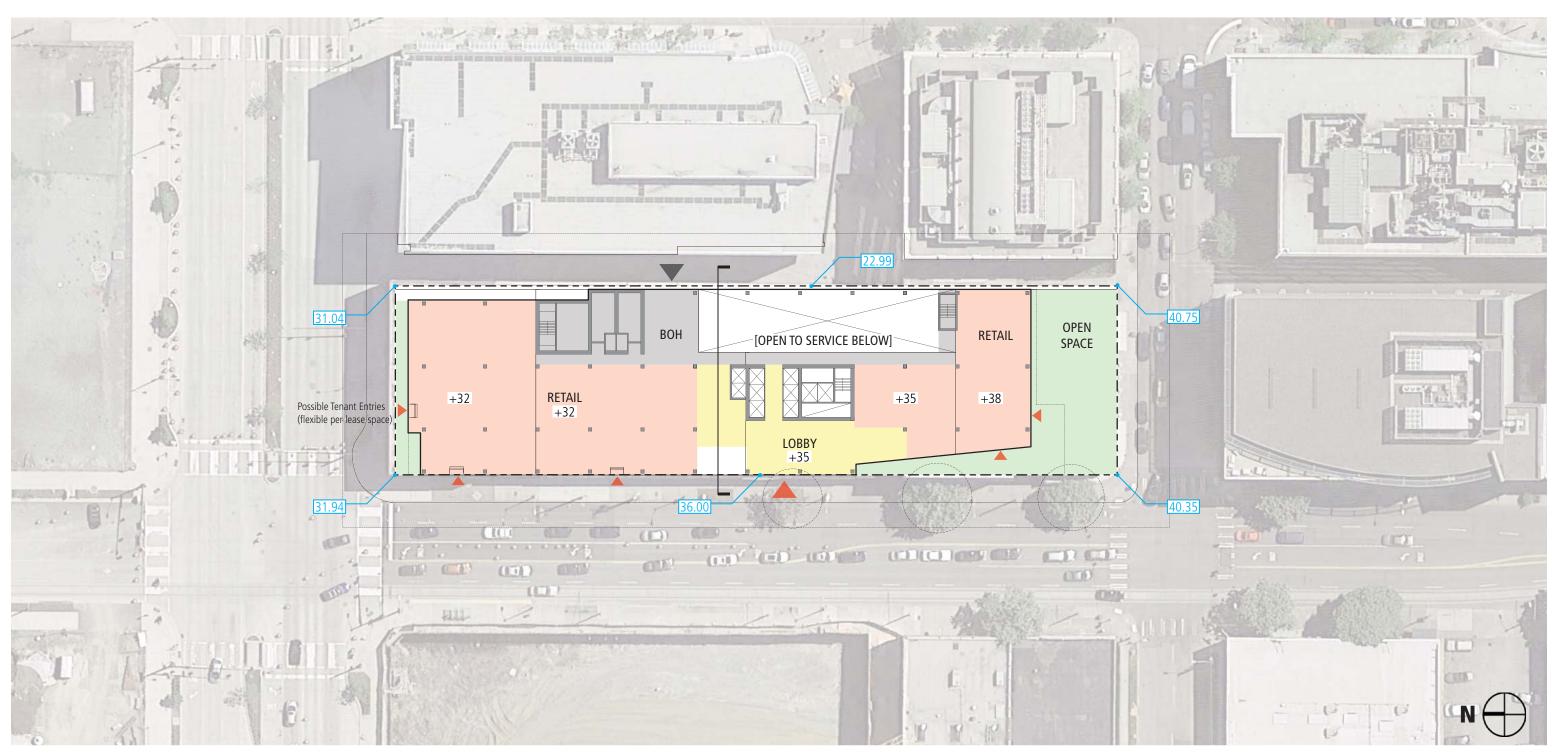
PHOTO-MONTAGE SITE PLAN WITH CONTEXT
